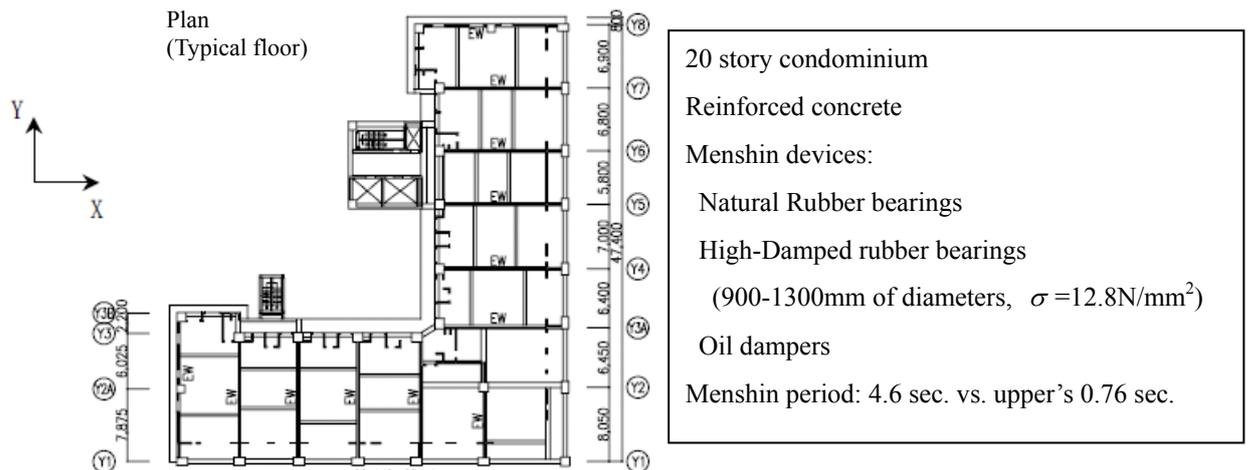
L-shaped plan with intermingled moment resistant frames and shear walls
